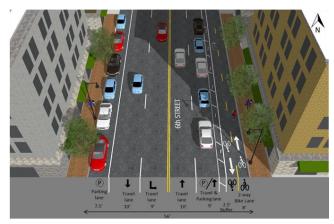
Existing and Proposed Roadway Cross-Section for Alternative 3 along 6th Street
